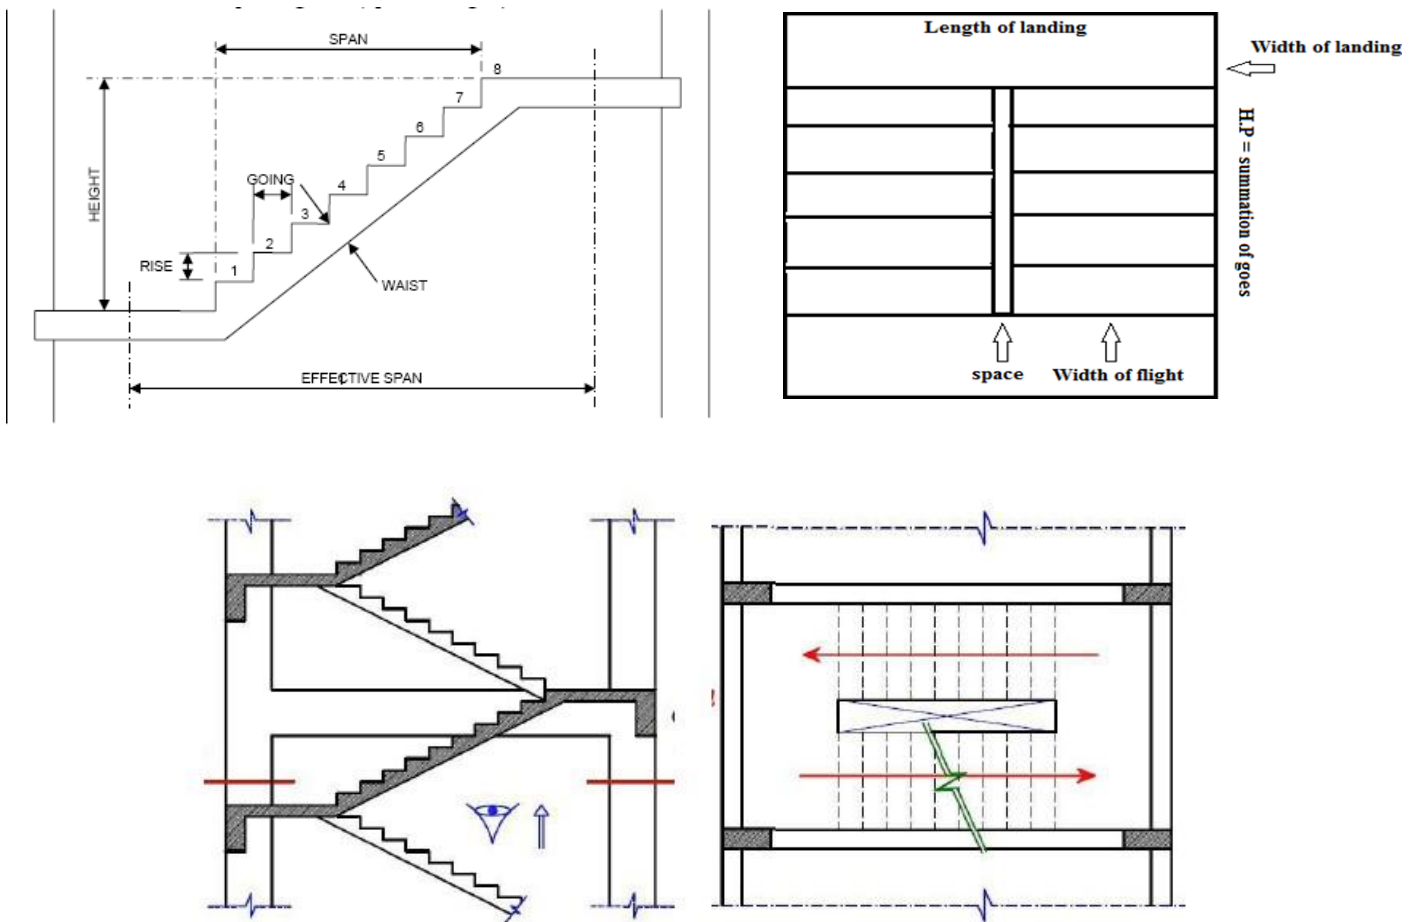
some technical terms which are used in connection with the planning and design of stairs
